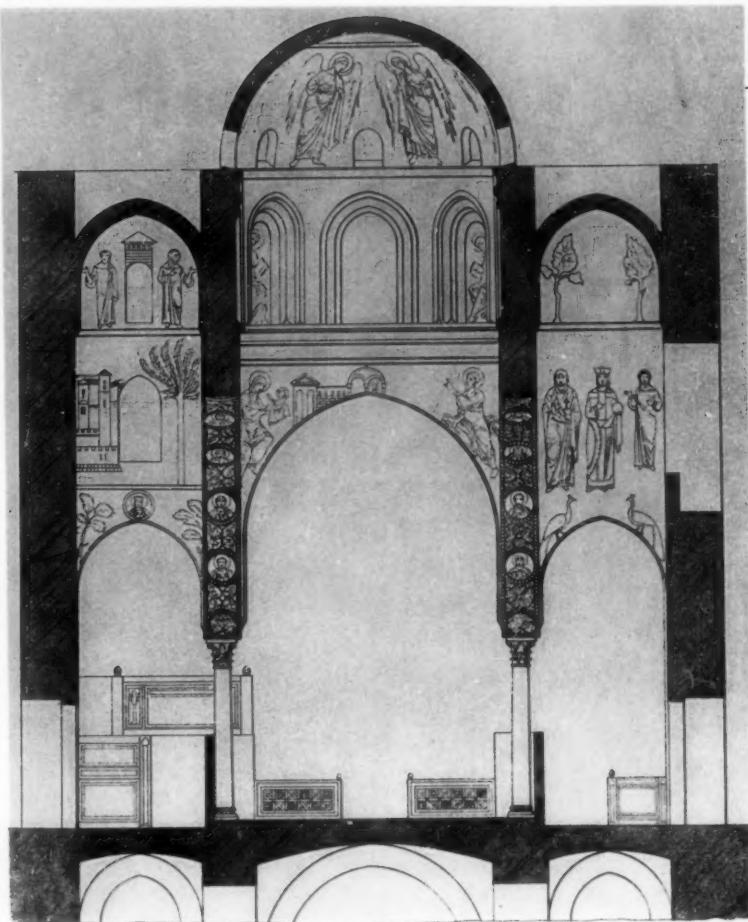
Cappella Palatina, Sanctuary, transversal section, looking west (after Terzi)
